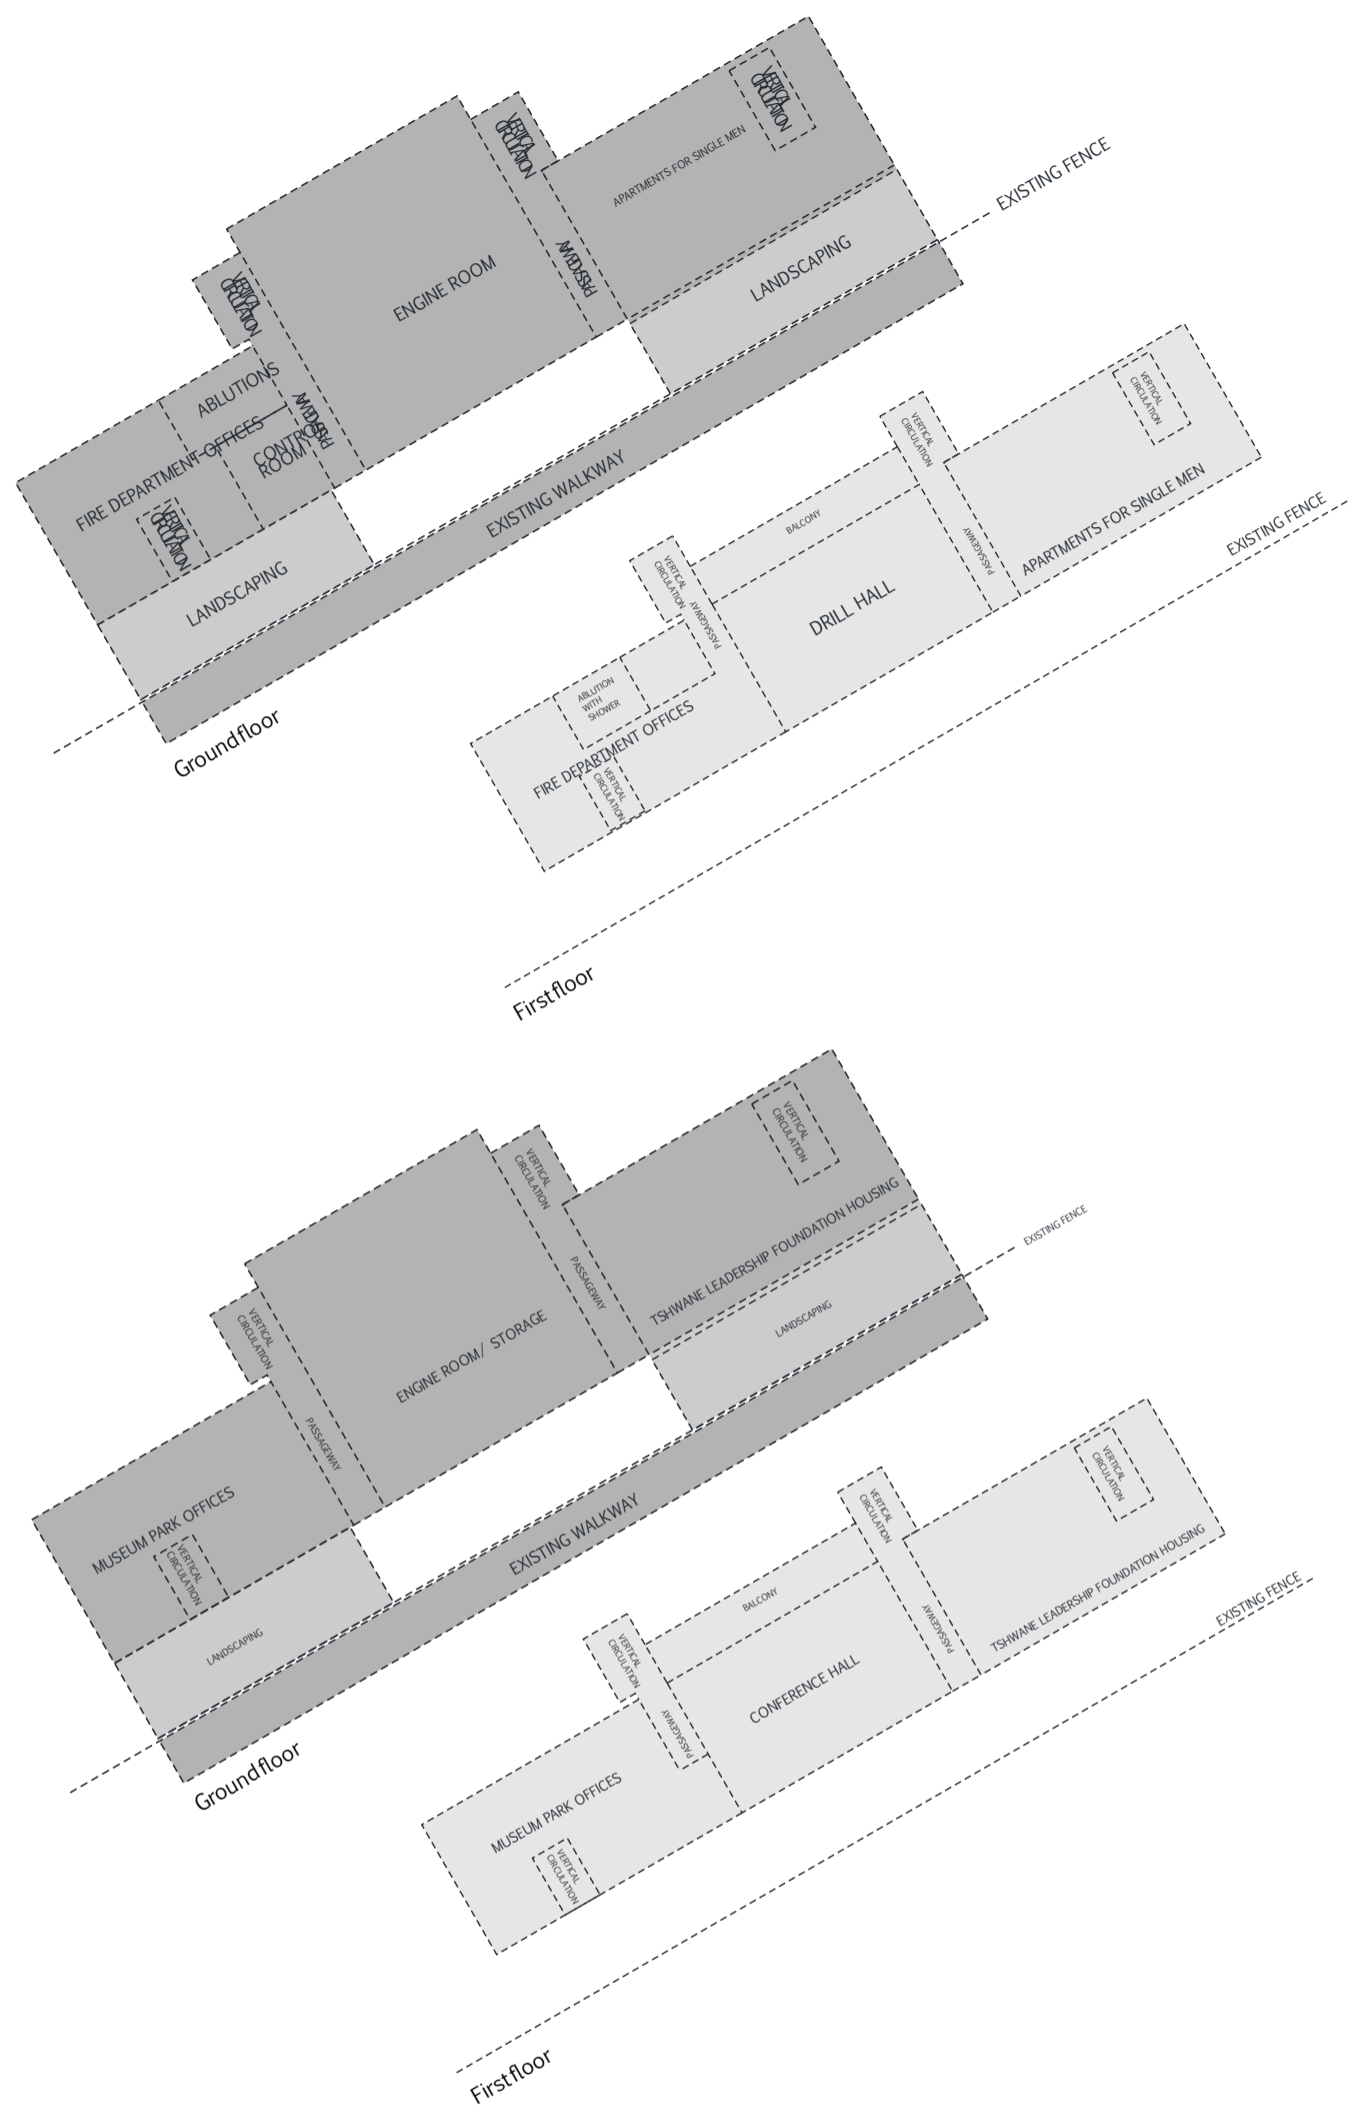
Original and existing uses within the proposed building for intervention (Author 2015)
